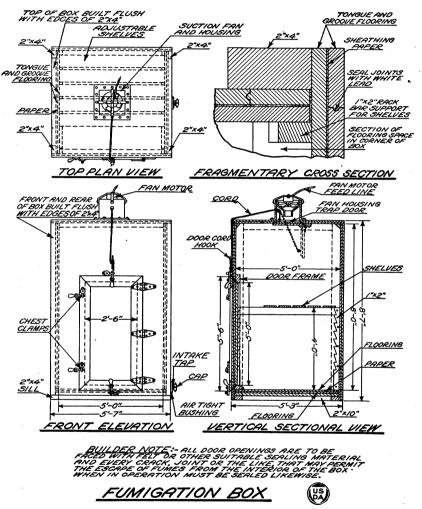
Plans of 200-cubic-foot fumigation box, showing details of construction.
